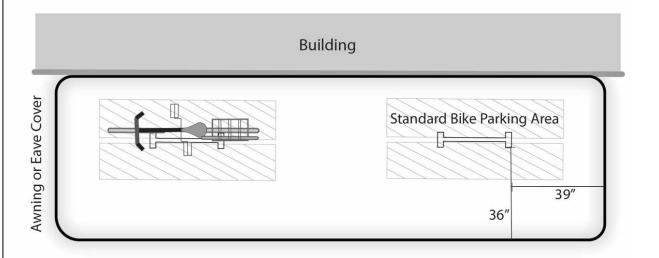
C.10.b. Covered Bike Parking Layout
